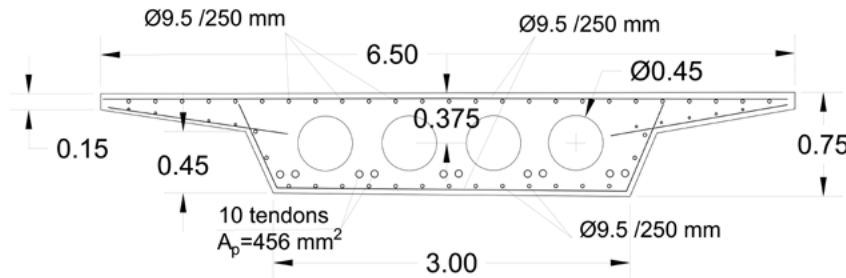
Cross-section and reinforcement at the bridge mid-span.
